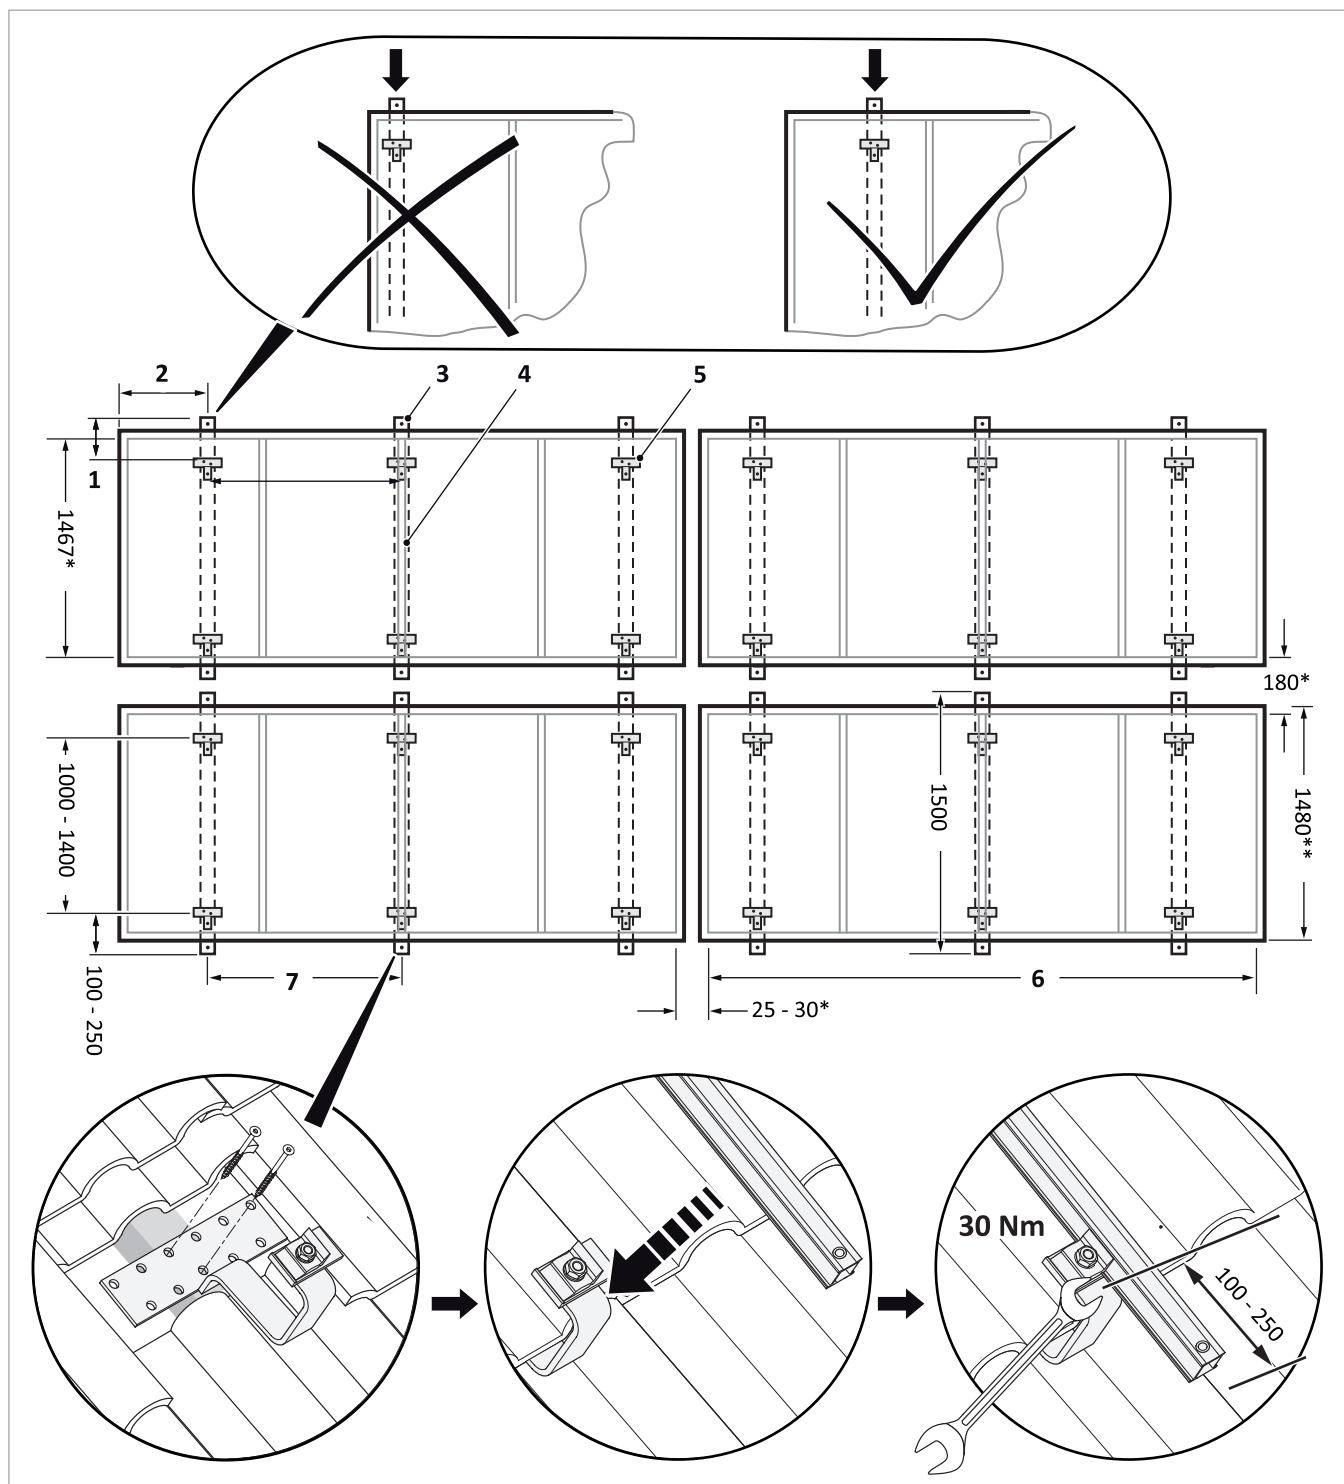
Installation of roof brackets/holding rails. The type of roof bracket varies depending on the roofing. Follow the roof bracket installation instructions.
